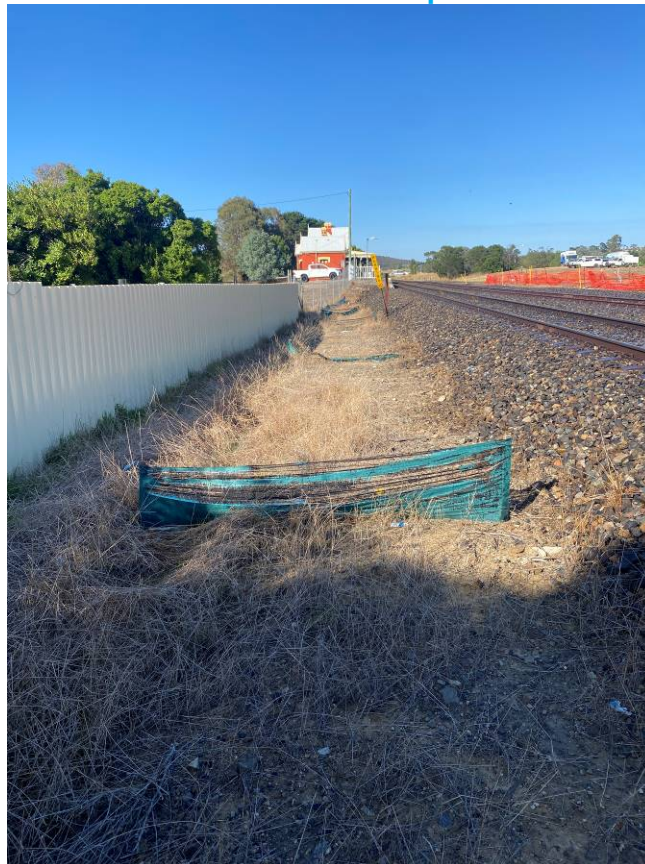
Damaged redundant silt fencing adjacent to the boundary of the Station Masters Cottage. Removal is recommended.
